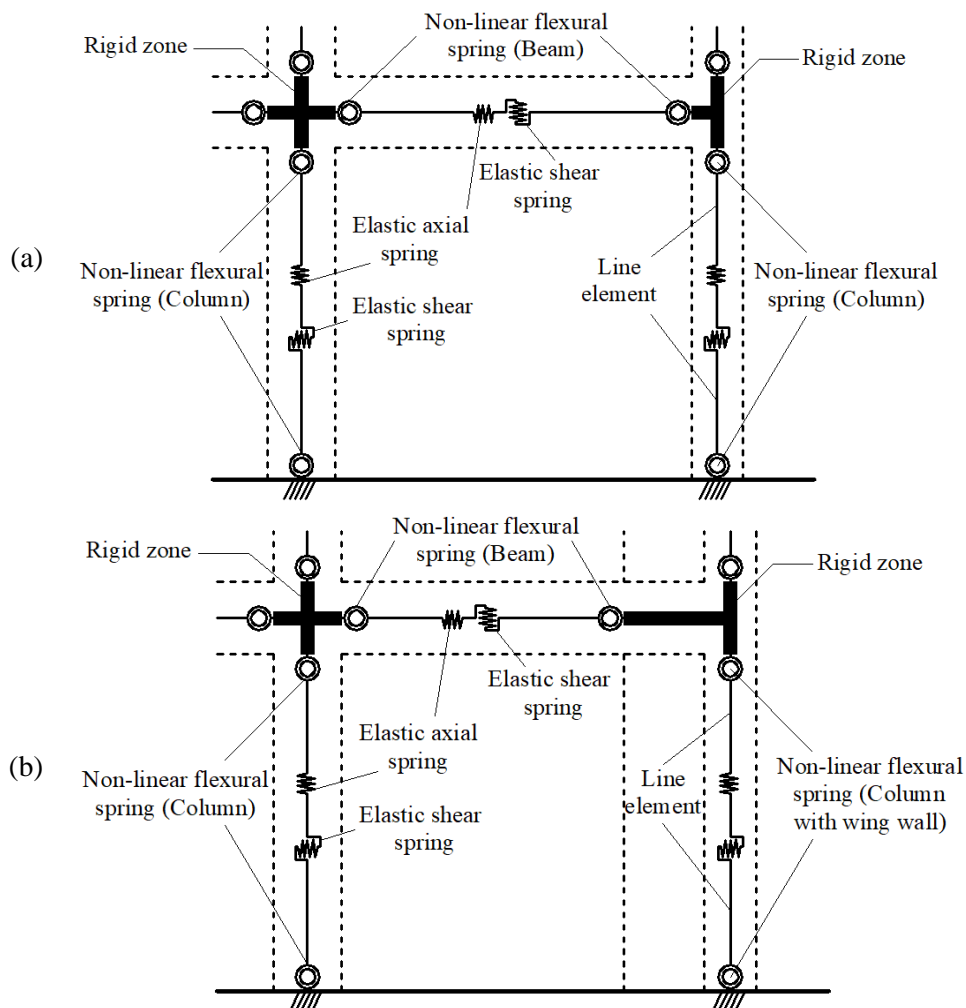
Modeling of the structural components: (a) Without wing walls (b) With wing walls
